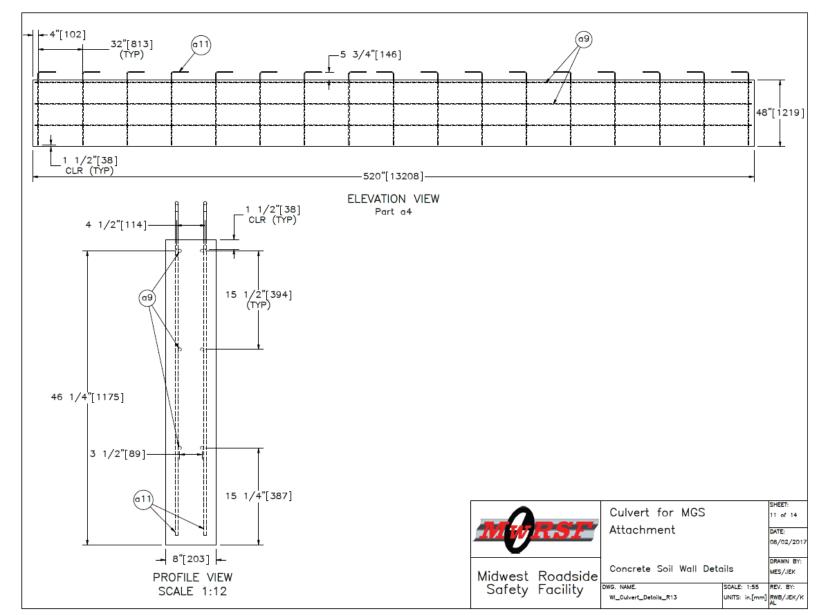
Concrete Soil Retaining Wall Details, Test Nos. CMGS-1 and CMGS-2
